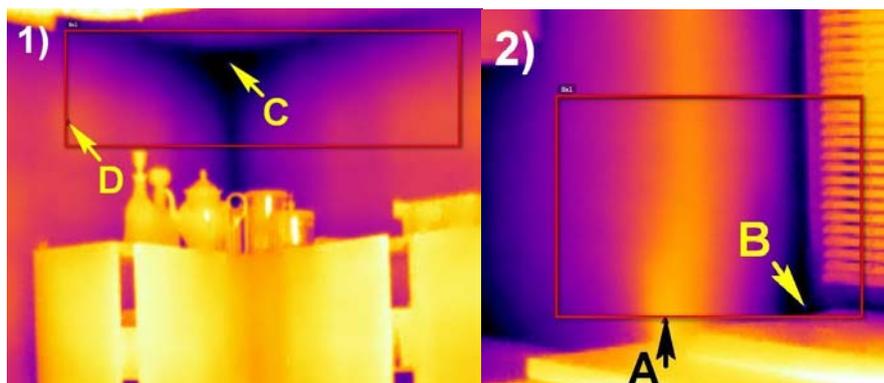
Thermograph of a wall corner inside the 1st building, Figure 8.2. Thermograph of window corners of the interior of the 2nd building [authors resources]
